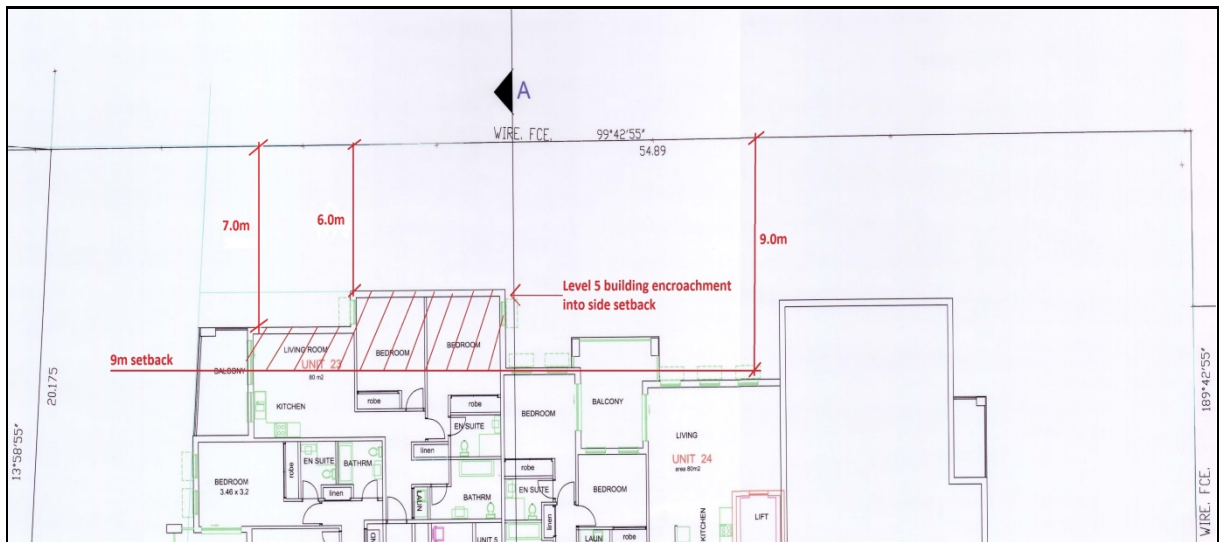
Level 5 building encroachment into 9m side setback on the northern boundary.
